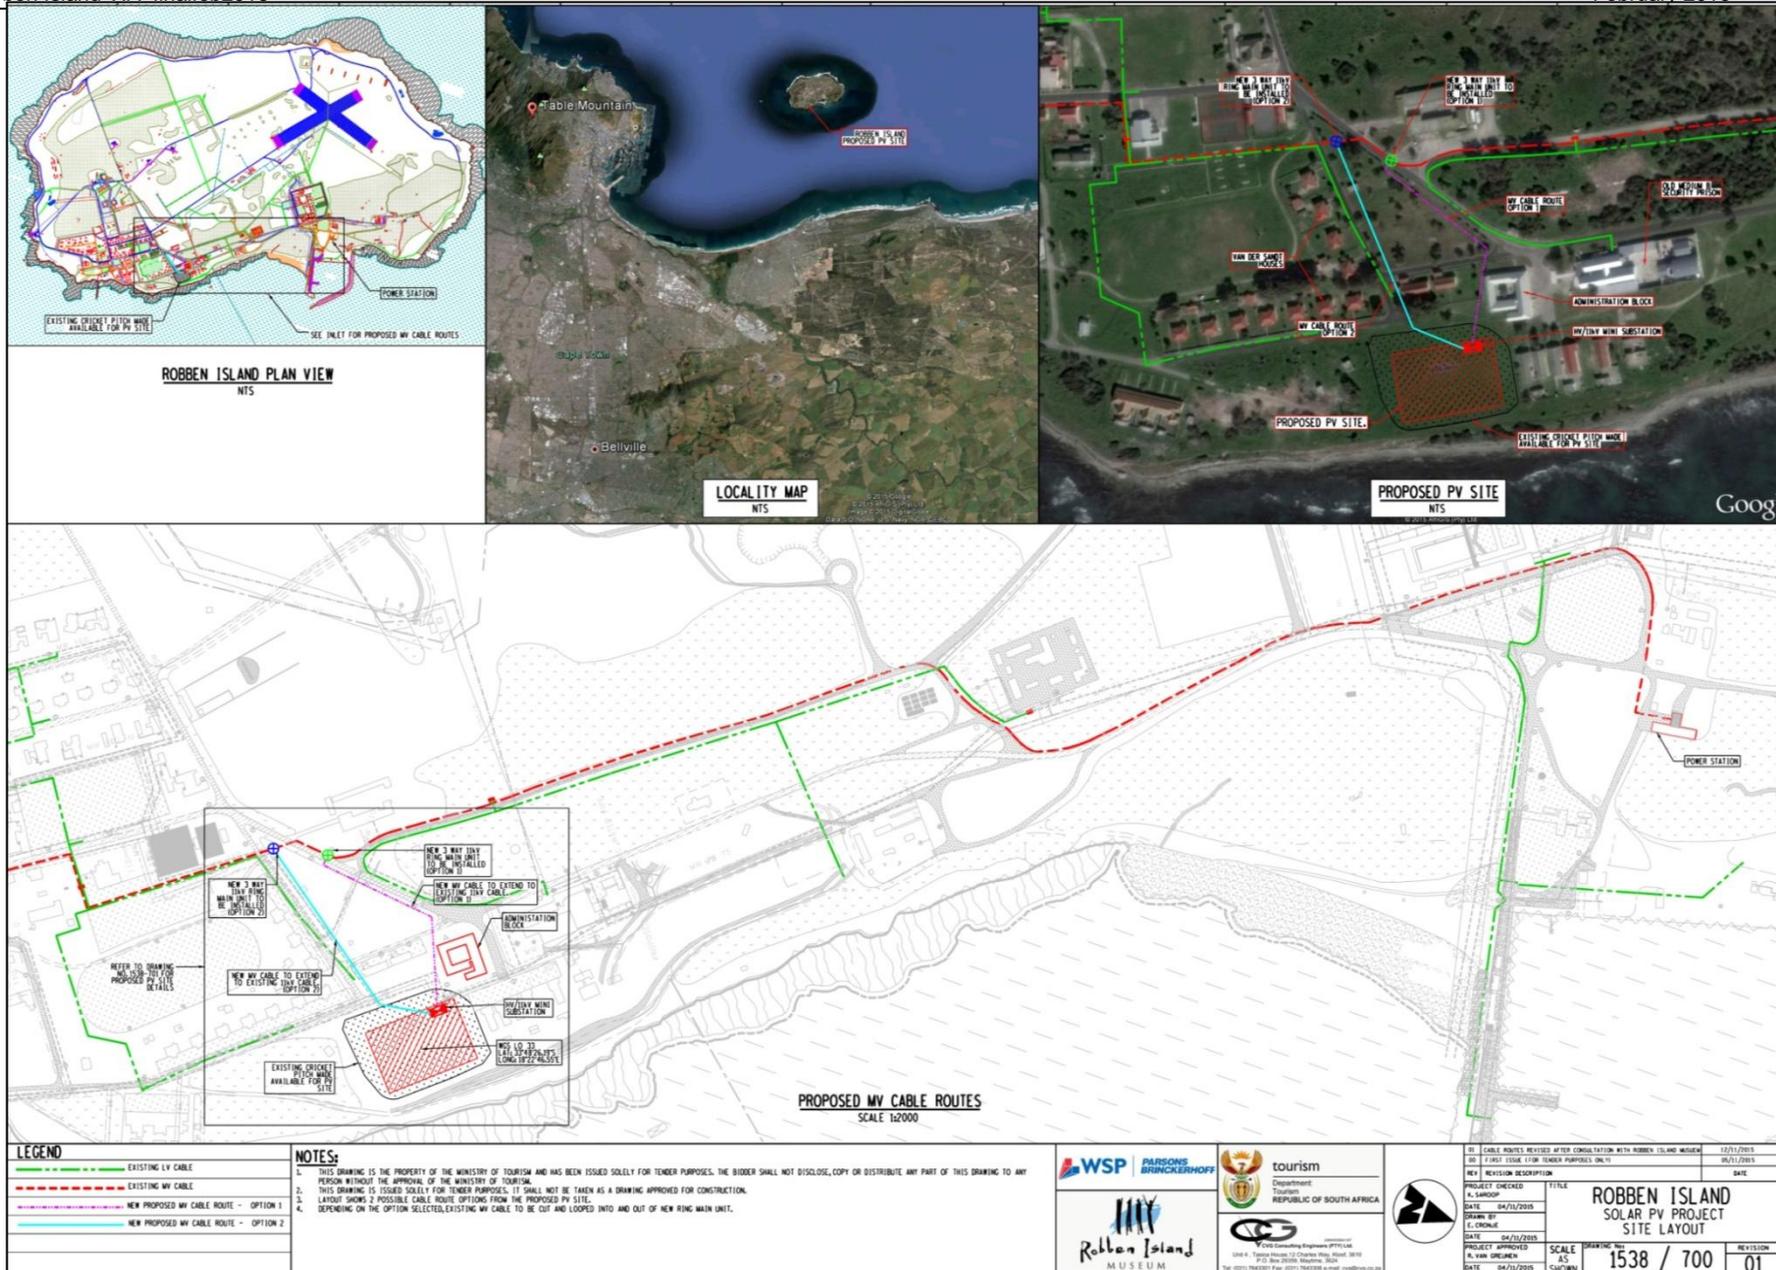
Proposed Site 1 Layout (WSP, 2016)
